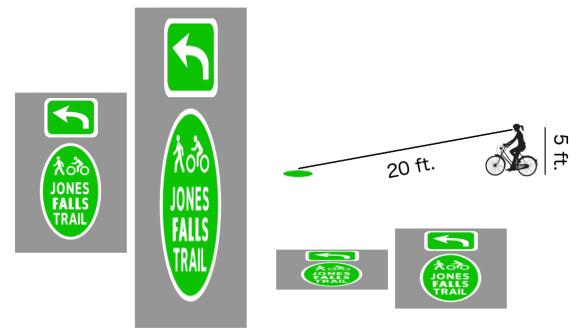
Left: Unstretched pavement marking and marking with 2:1 stretch. Right: Same markings as viewed from 20 feet away and 5 feet off the ground.
